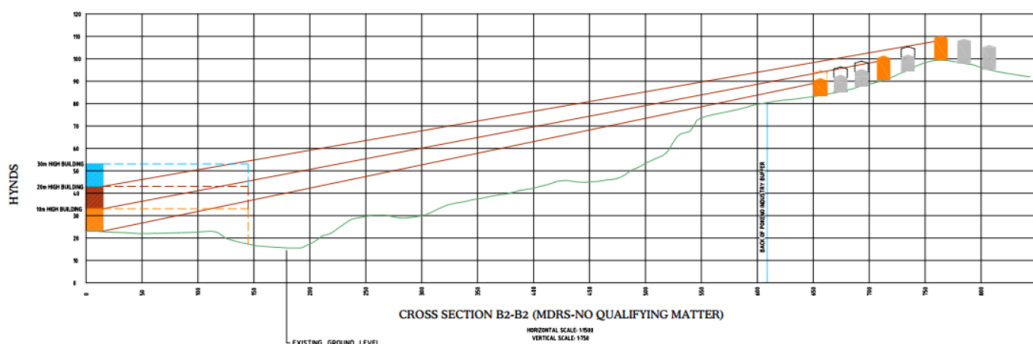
Cross section showing MDRS on HVL land (orange buildings have sightlines shown)
